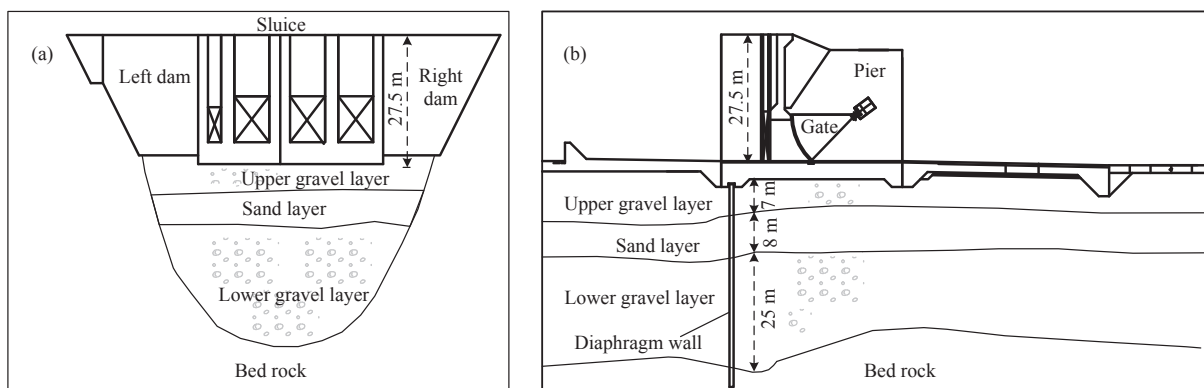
Geological profile of the dam foundation. (a) Longitudinal section, and (b) Transverse section.
